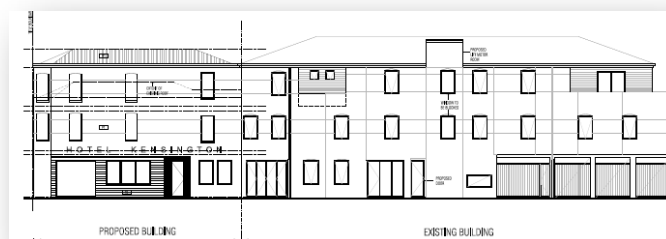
proposed south elevation with added floor and showing existing rear addition.
